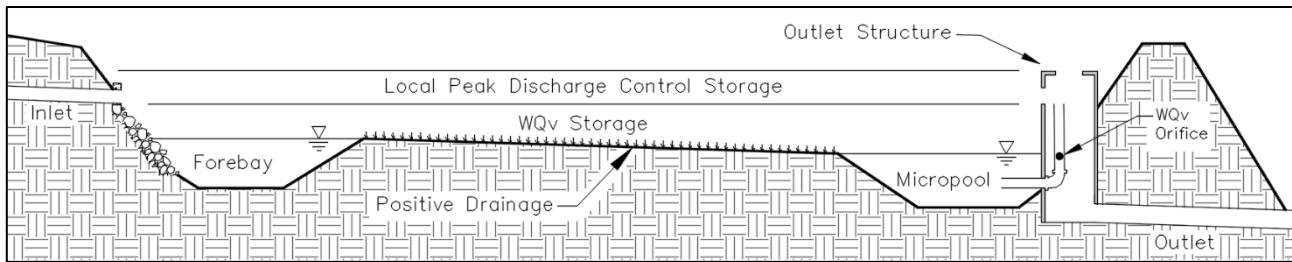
Typical Dry Extended Detention Basin Profile
